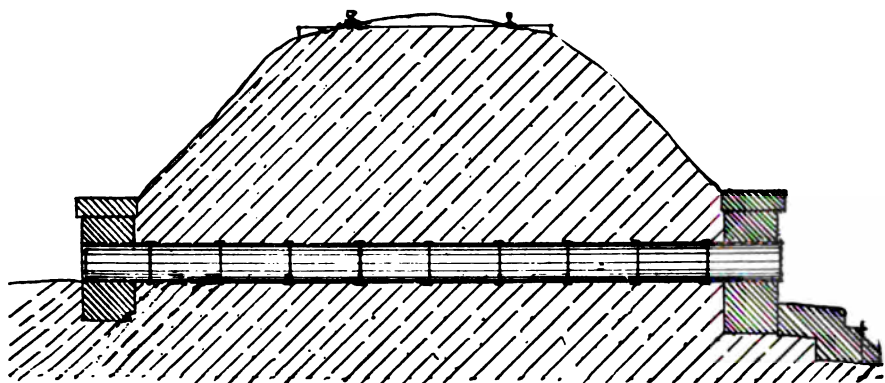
SECTION VITRIFIED SEWER PIPE ONE FOOT INTERNAL DIAMETER.
